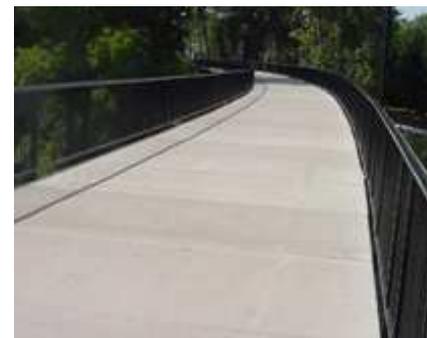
Concrete deck panels on Union St Bridge, Portland, OR
